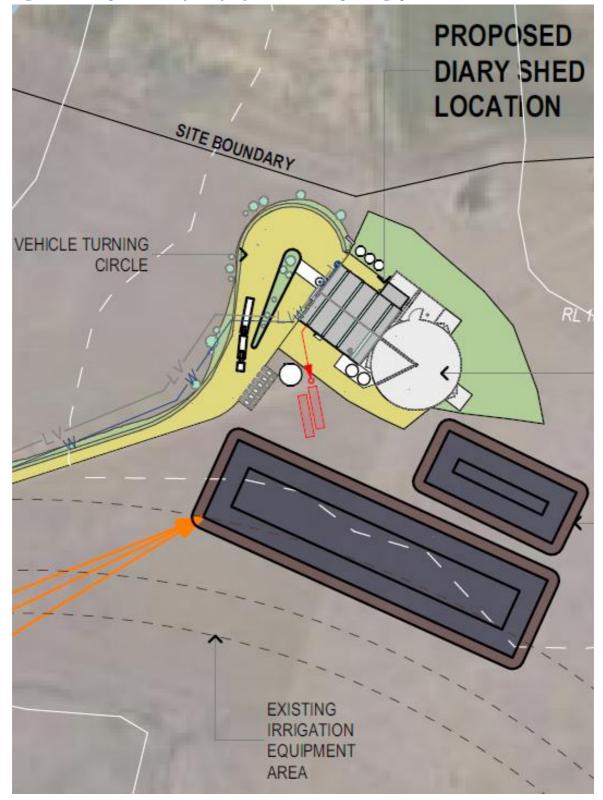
Proposed Norley dairy layout with 6 car parking spaces.
